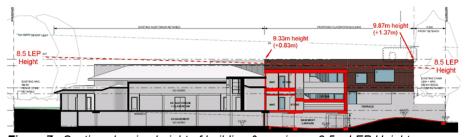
Section showing height of building & maximum 8.5m LEP Height
